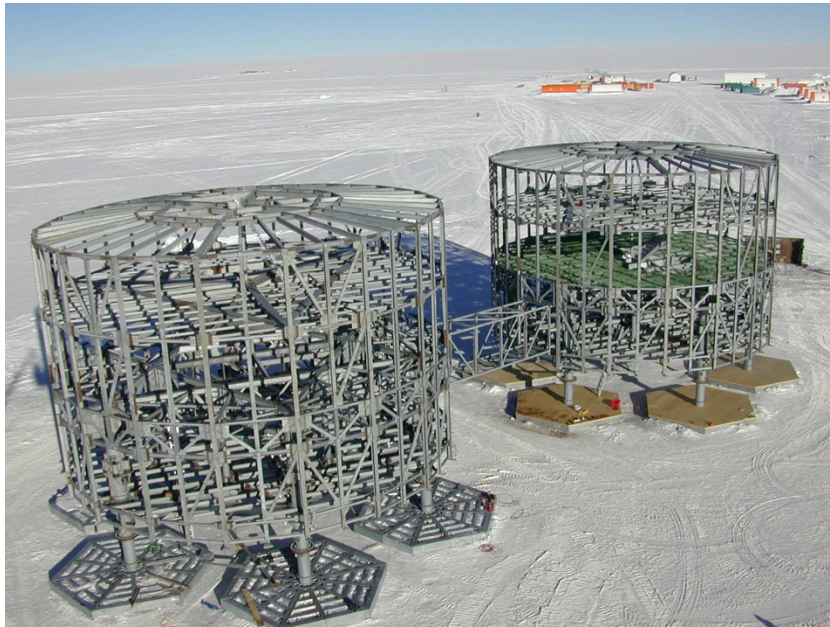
Constructing the lifting columns on site (courtesy of P. Godon 2010).
